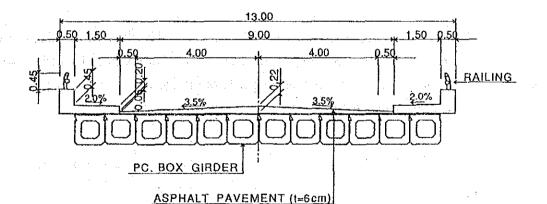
TYPICAL CROSS SECTION OF ROAD BRIDGE
